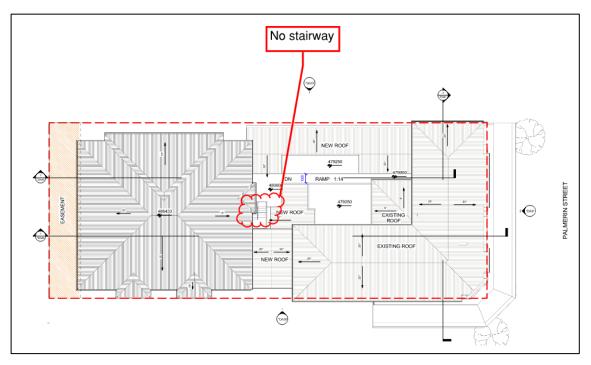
Floor Plan – Proposed Roof Plan (Amended by Council 19 August 2024)
